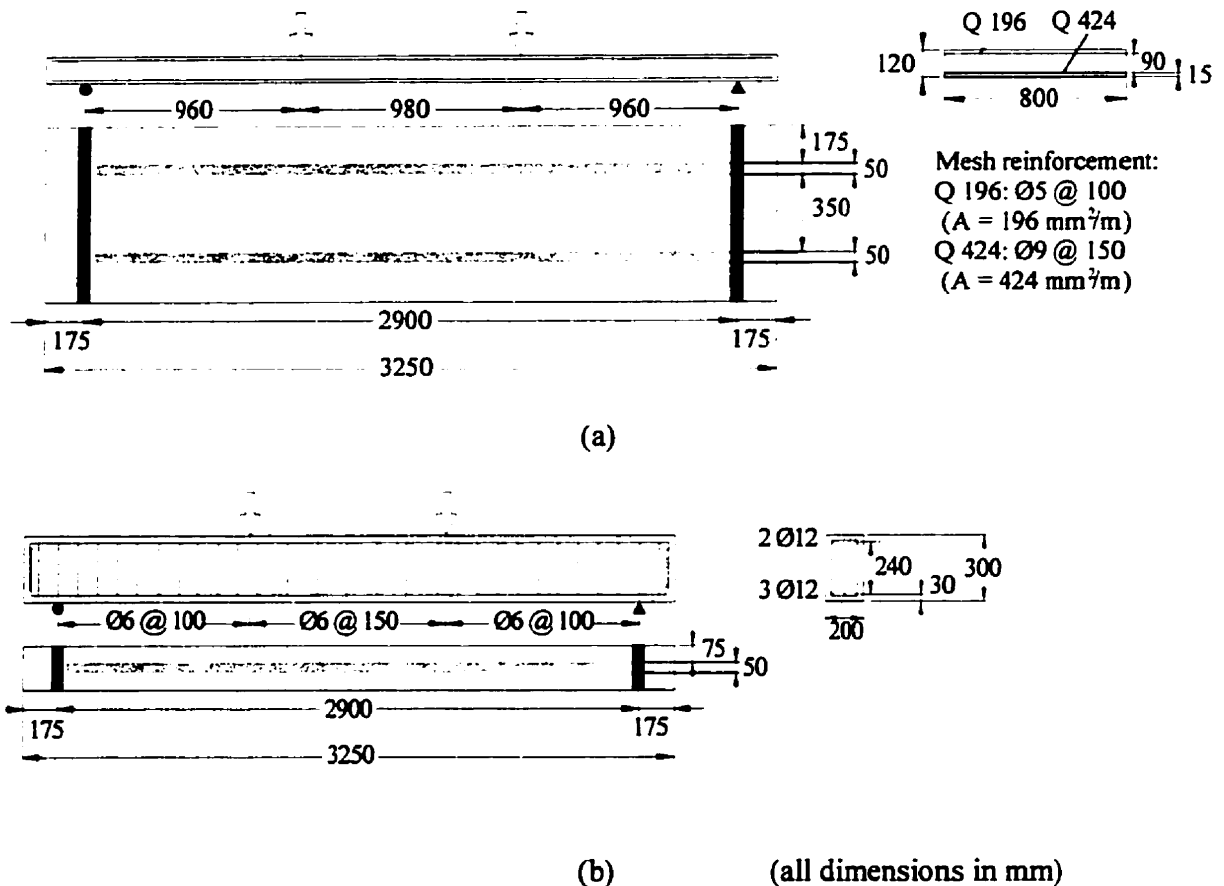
Geometry of Žarnić specimens: (a) slab strip and (b) beam [11]
